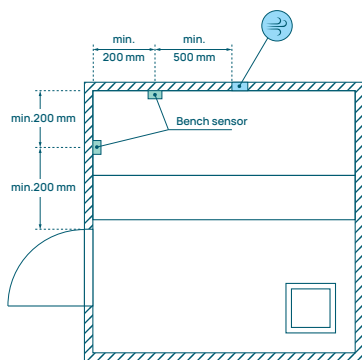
Installing the bench sensor on the wall to the opposite side/corner of the heater
